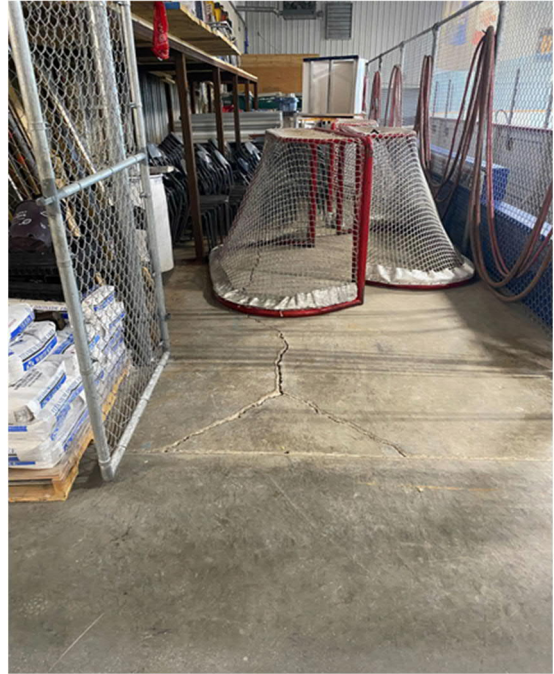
Crack in Slab on West Side of Rink
